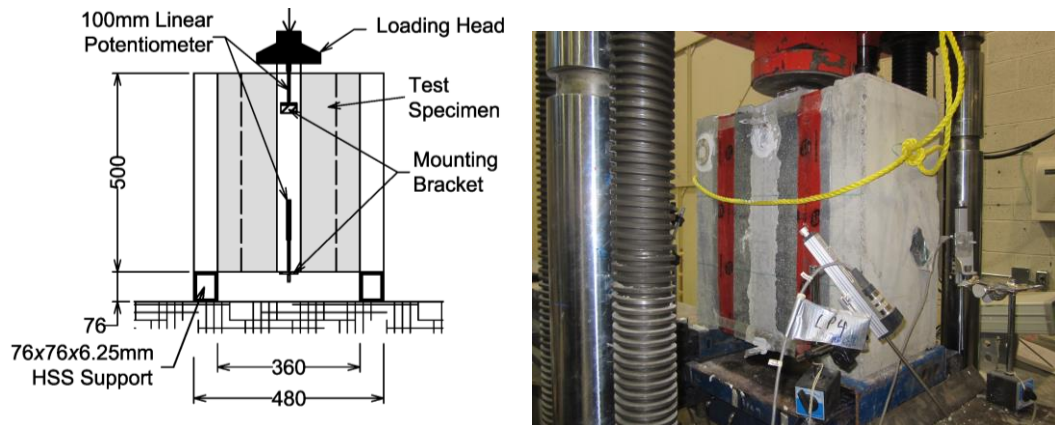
Push Through Test apparatus schematic and photograph, all dimensions in mm (100 mm = 3.94 in)
